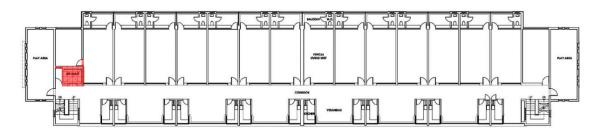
Typical floor plan of Block A of the former Police Married Quarters.
